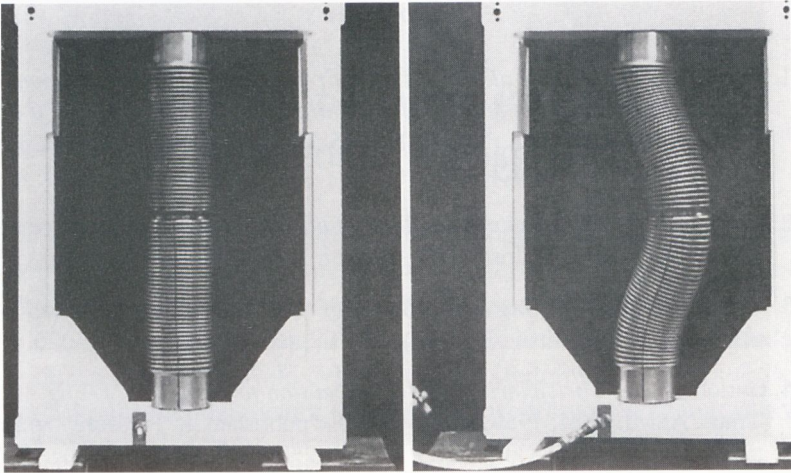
Overall collapse of a ring-stiffened cylinder subjected to external pressure
